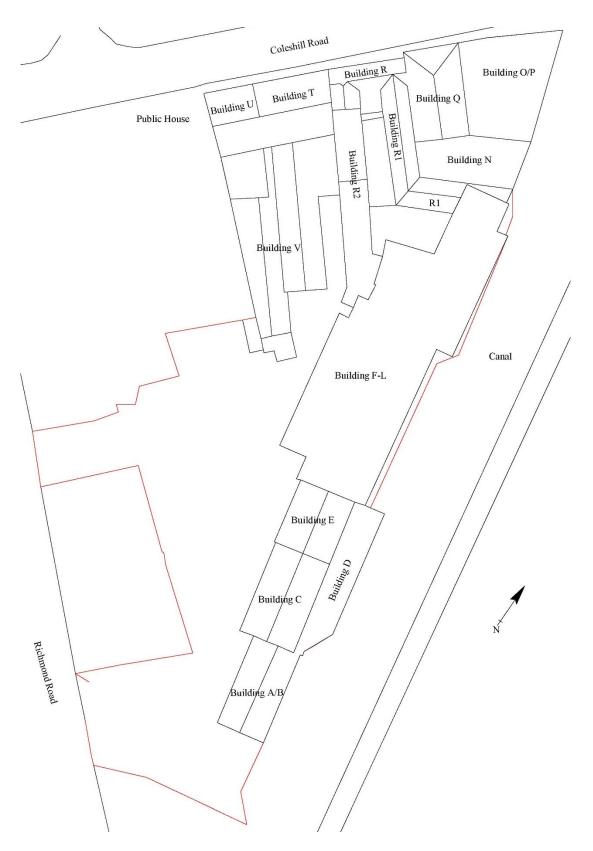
Site building identification letters See Appendix 1 for main plans and elevations
